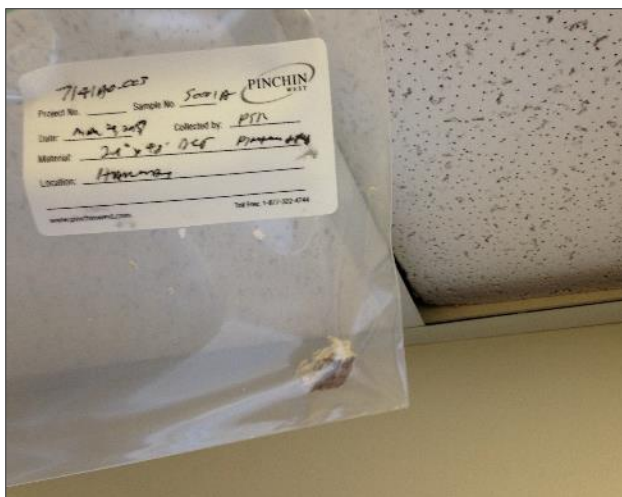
Acoustic Ceiling Tile, 24"x48" Pinhole and Fissure (Sample S0001A-C) Hallway Location (117).
